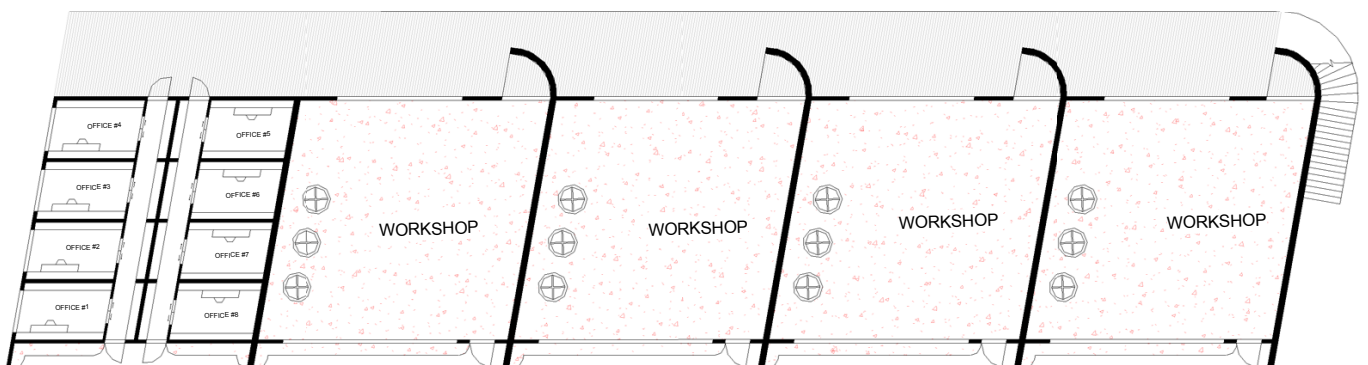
1:100 Workshops and offices as laid out in site plan.
